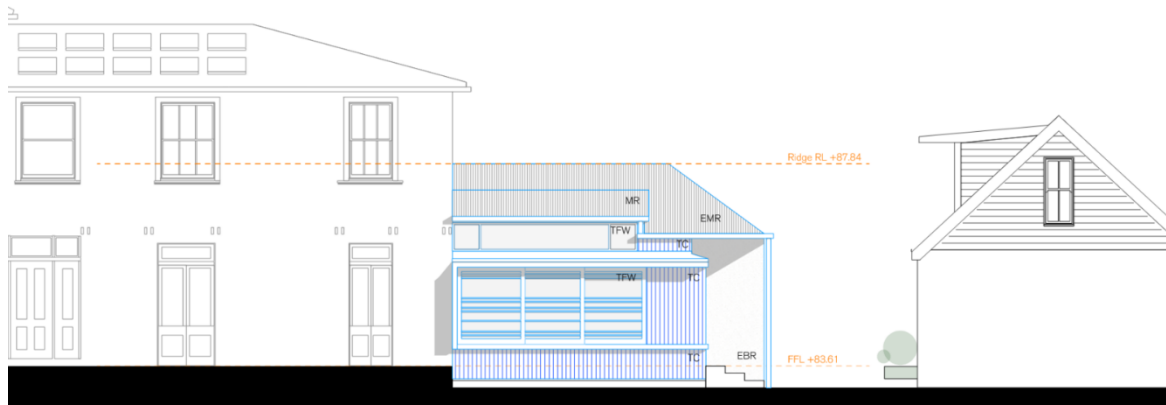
Proposed northern elevation - 2 Bishops Avenue, Randwick (Source: McGregor Westlake Architecture)
